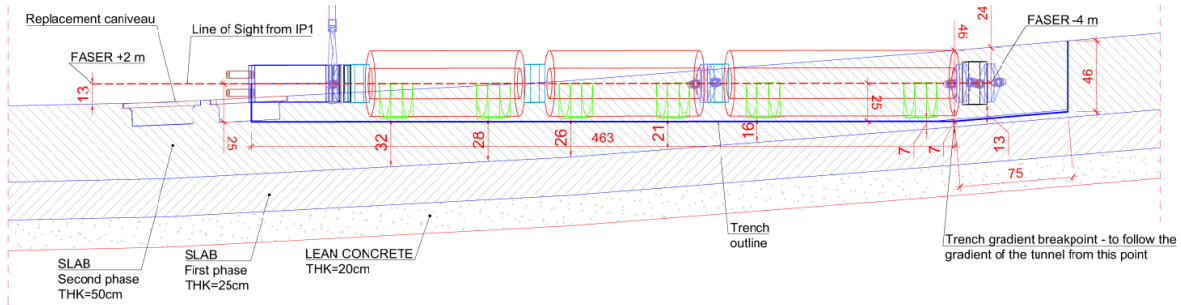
Section showing trench and experiment in relation to TI12 floor and LOS.
